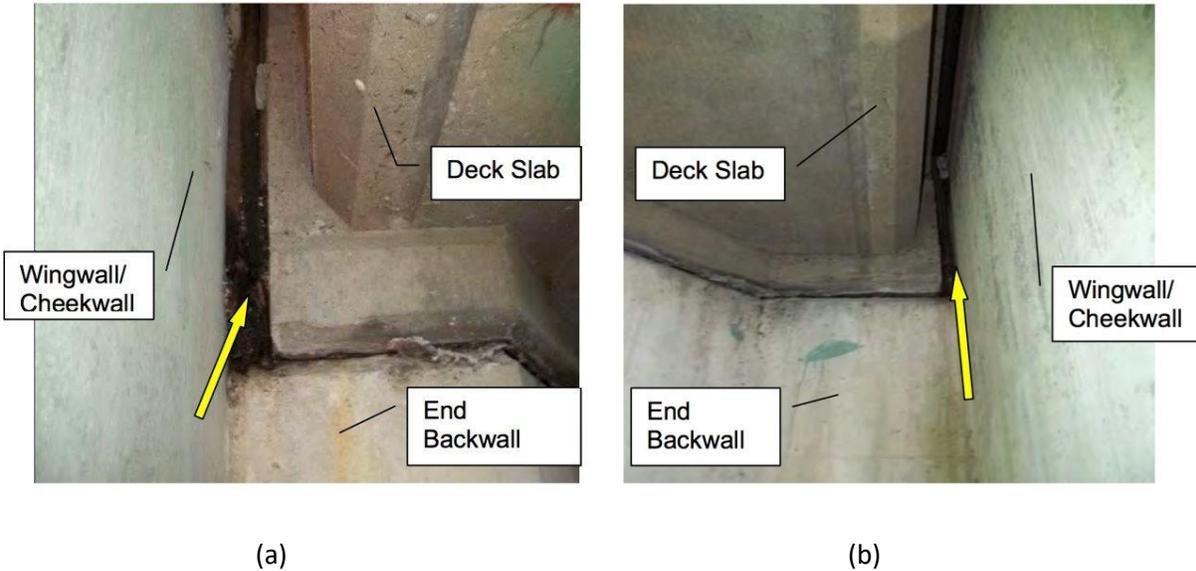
Location of joint filler with possible ACM (Environmental Planning & Management, Inc. 2013). (a) shows the south abutment at east wing wall, and (b) shows the south abutment at west wing wall.
